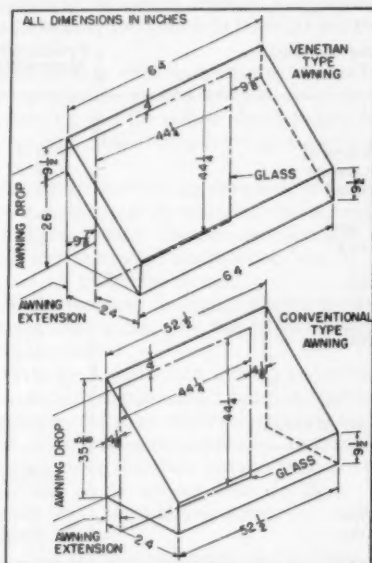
SHAPE AND SIZE OF AWNING TESTED
